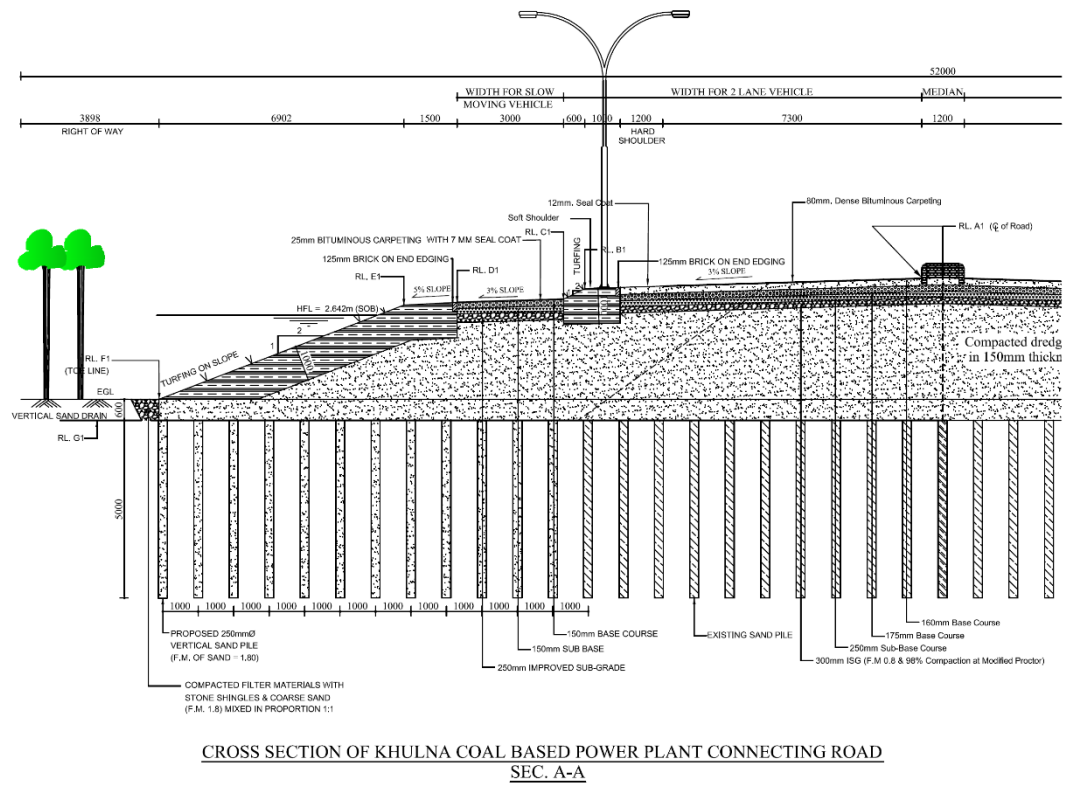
Final design for 4 lanes and 2 lanes slow moving road
